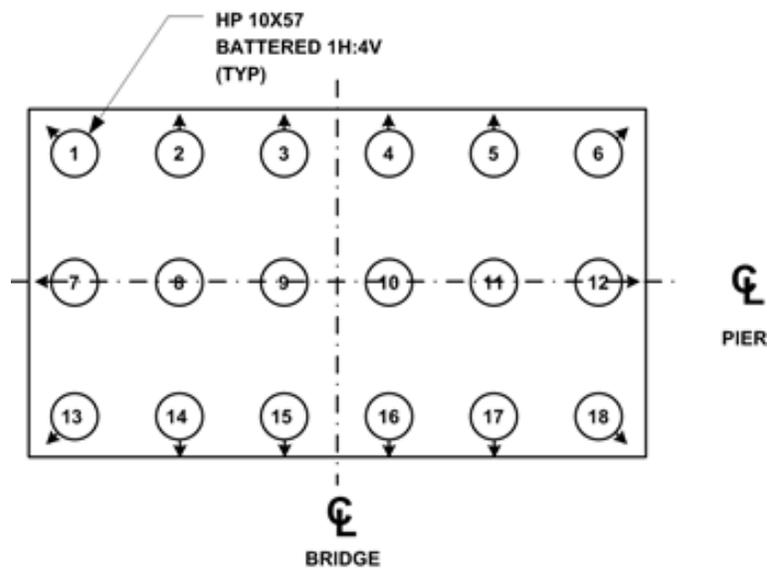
Track 1 Example 2: Pile arrangement at a pier
